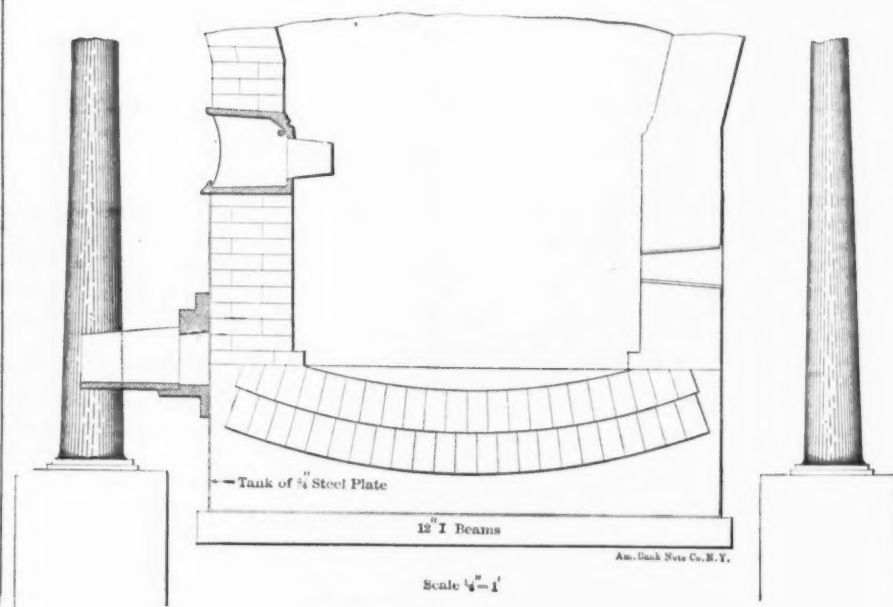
Furnace Hearth Inclosed in Steel Tank and Resting on I Beams.
